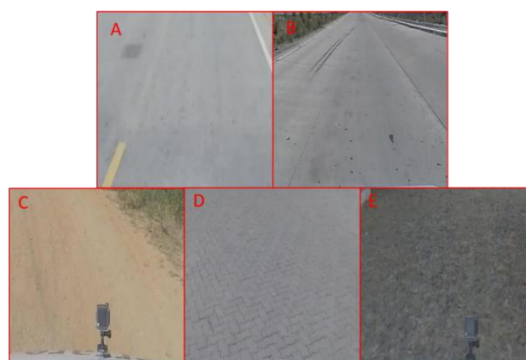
Pavement Classes (A) Asphalt, (B) Concrete, (C) Unpaved, (D) Interlocking and (E) Cobblestone/Stone
